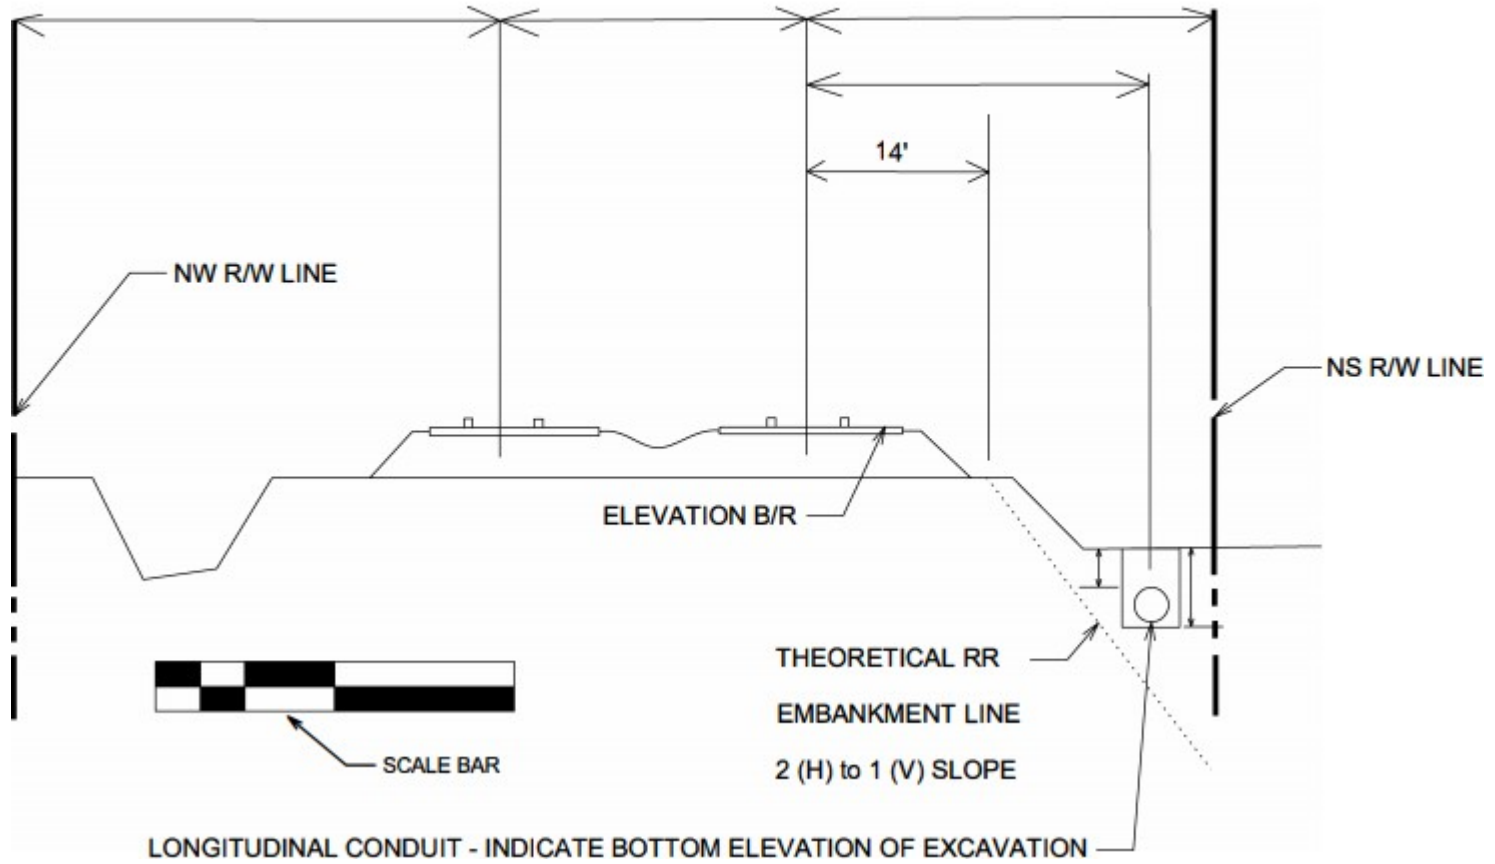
Plate VIII - Sample Conduit Parallel Plan and Profile Views
